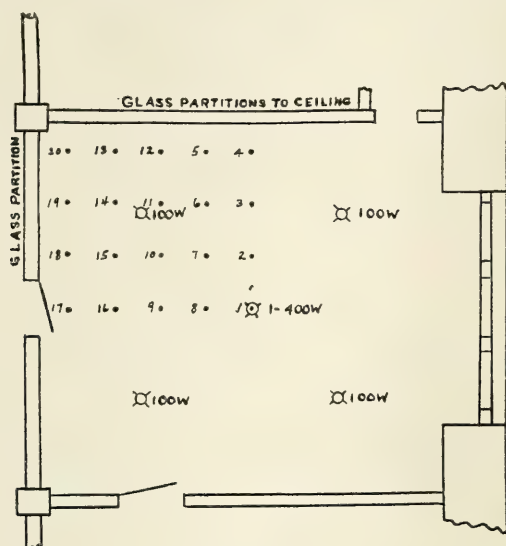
Floor plan of private office showing test stations, Area, 378 square feet; watts per square foot, 1.06.
